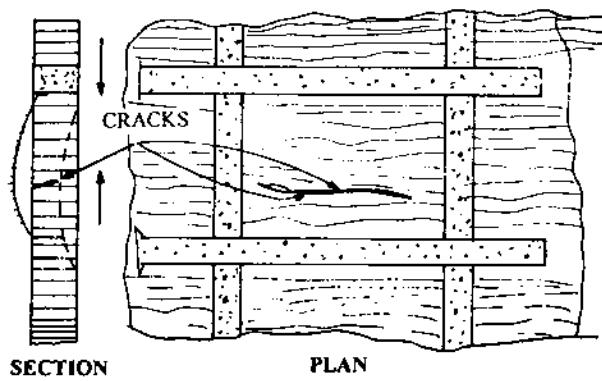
Horizontal cracks in brick panels of a framed structure
